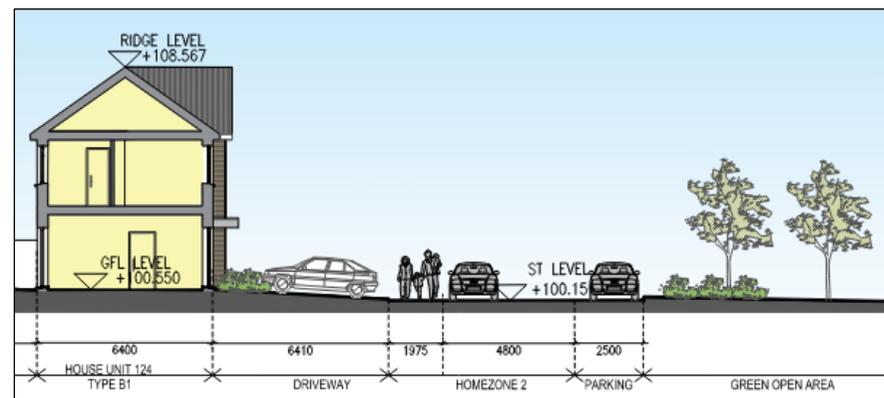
Section illustrating relationship between Public Open Space and Surrounding Streetscape
